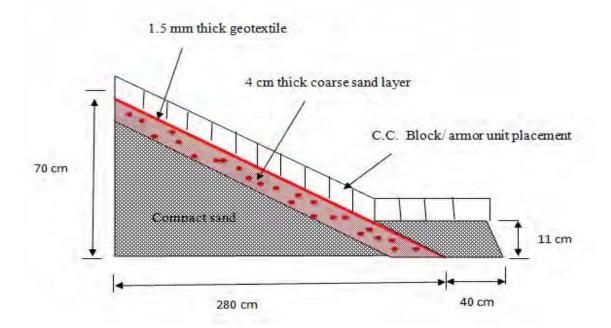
Detail design of revetment with toe protection and filter layer (condition-2)
